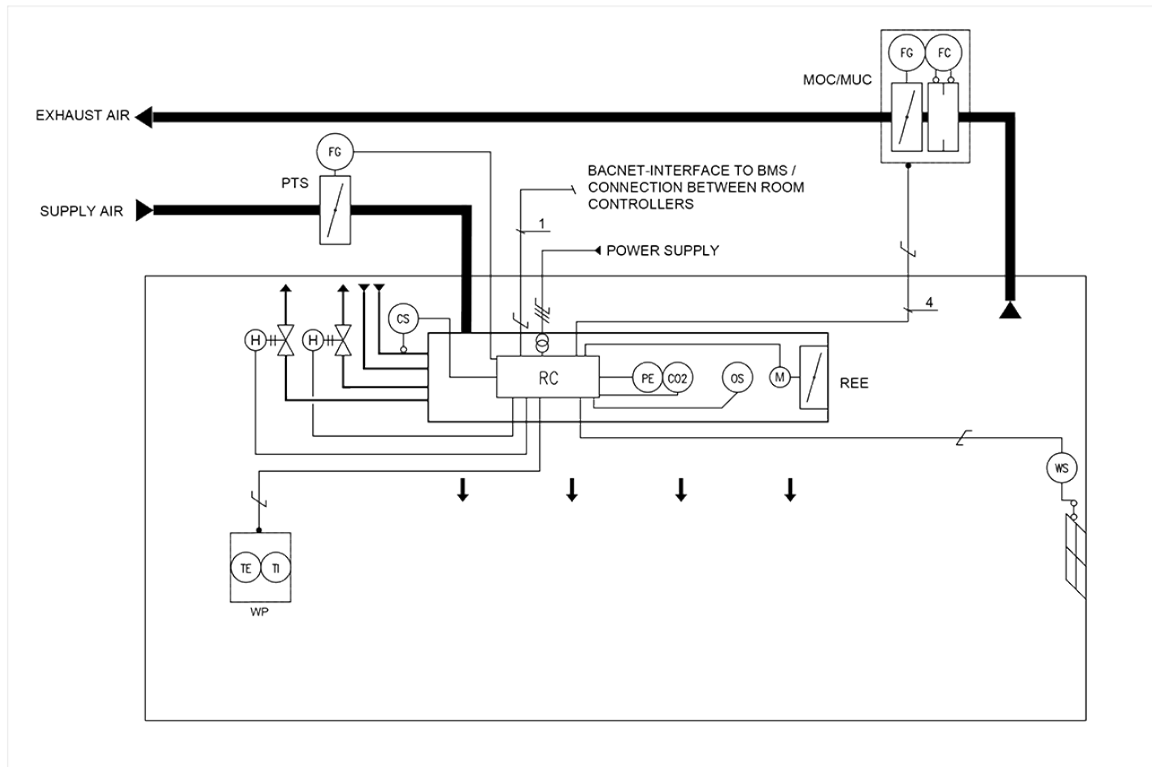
Schematic drawing: Halton Rex Exposed (REE) chilled beam (4-pipe) controlled with Halton Workplace WRA room automation controller
